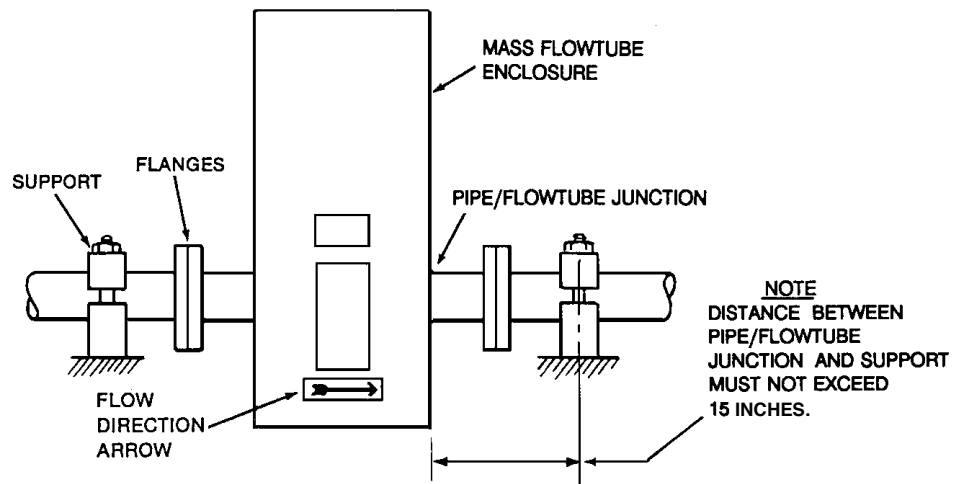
Flowtube Mounting with Flanged End Connections - Horizontal Pipeline
